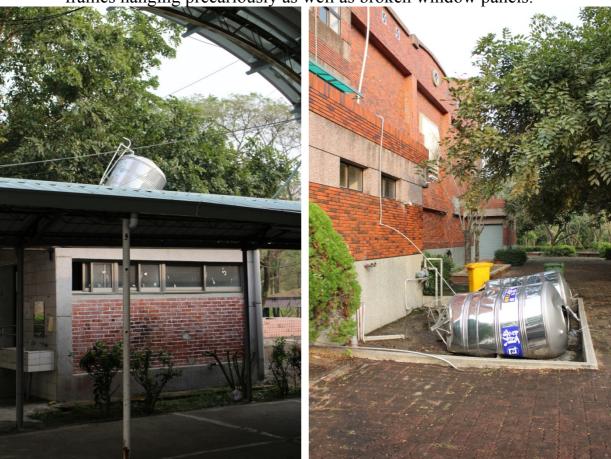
Failure of many stainless steel water tanks at Yujing Junior High School
